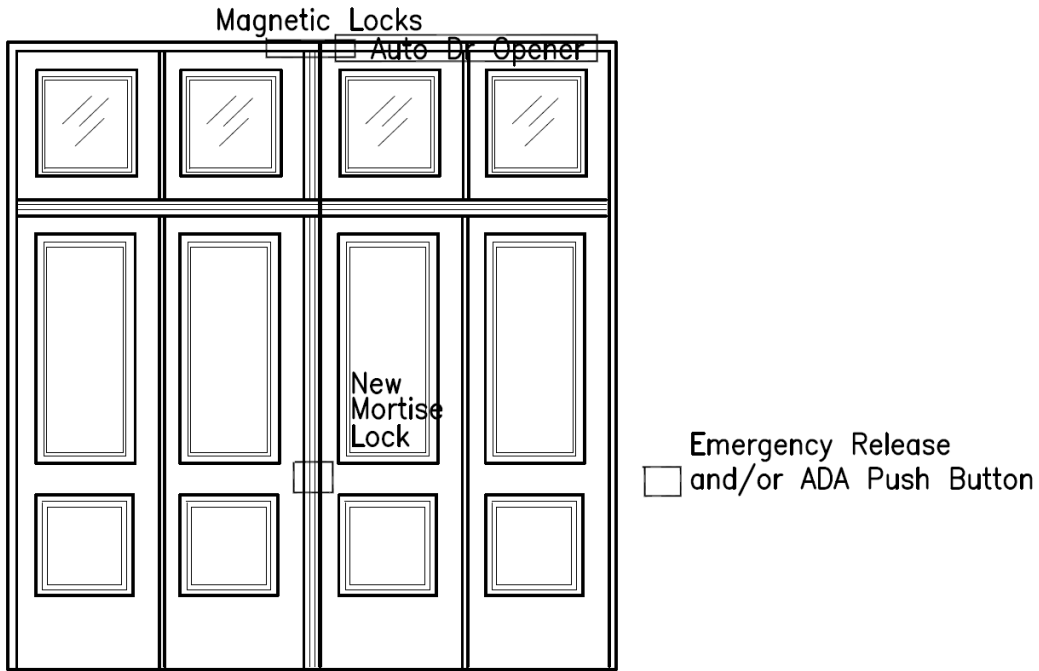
Northern door showing proposed ADA automatic door equipment.
